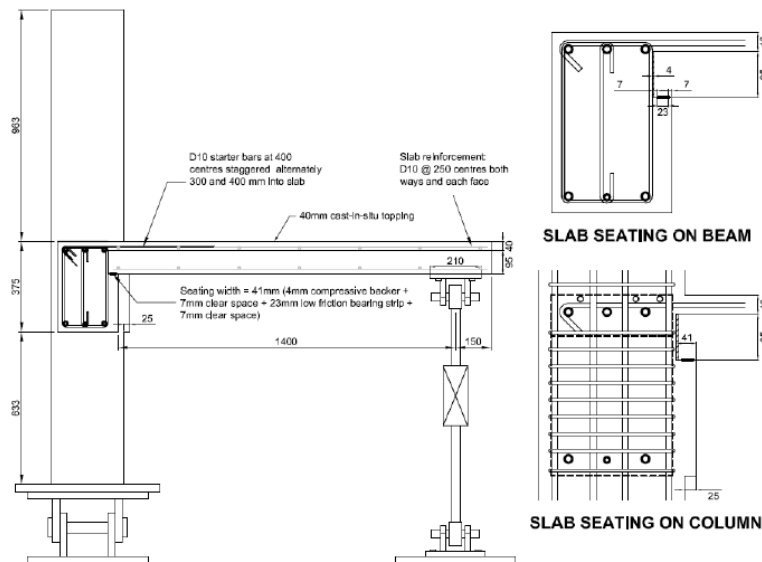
Details of specimens SB1 and 2 tested by Au (2010).
